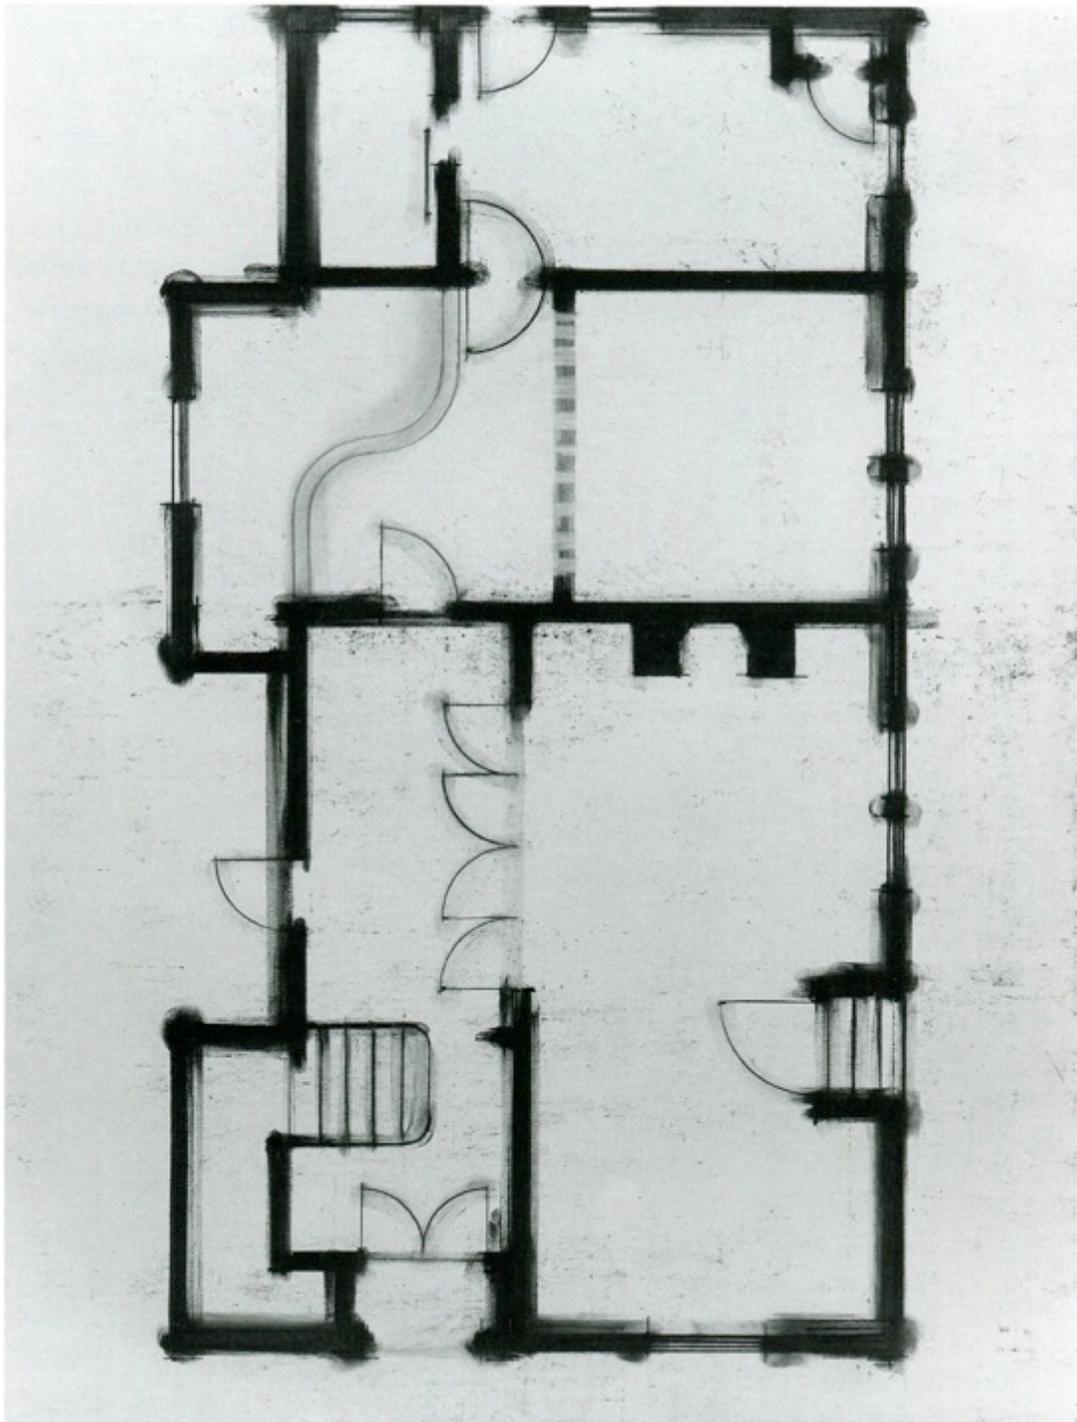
Ground Floor Plan of 500 Capp Street, 1976–77.
